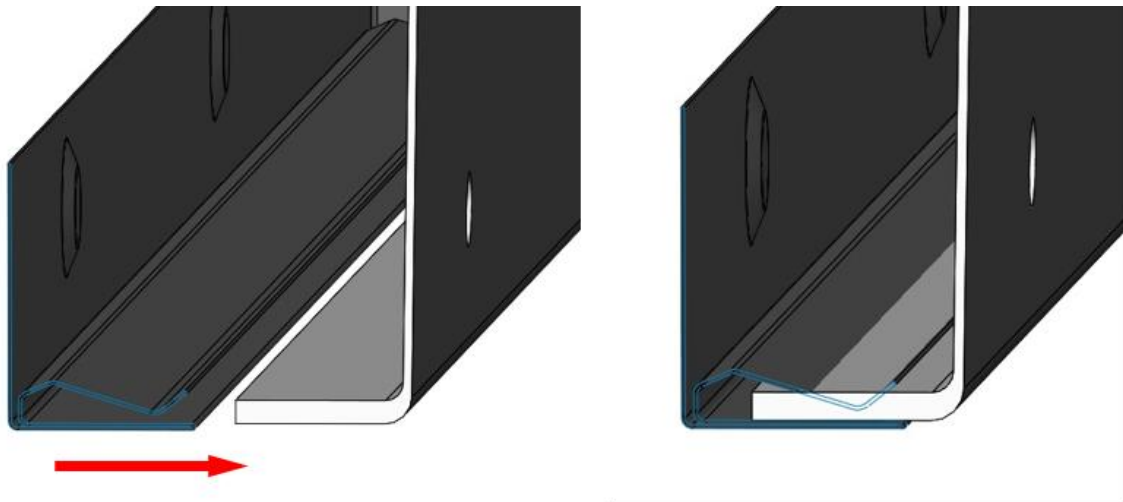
breaker-liner connection detail, the breaker is sliced over the liner
